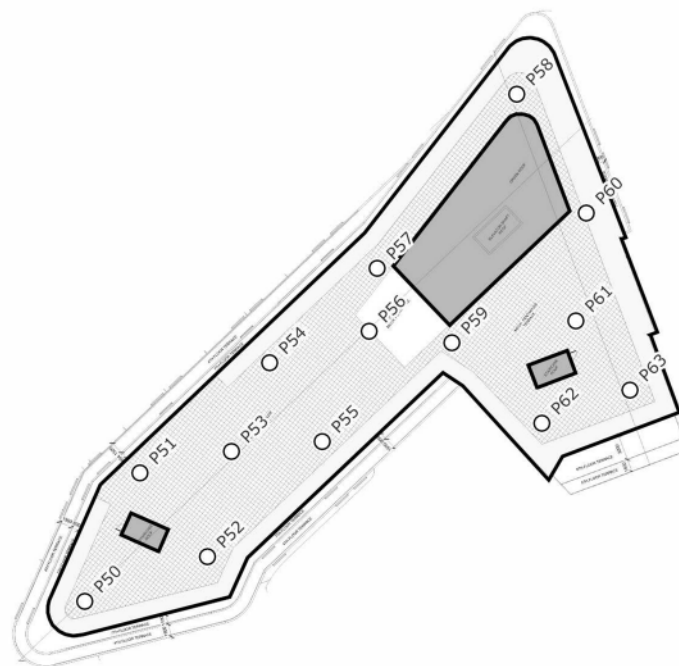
Study Point Locations and Target Wind Speed Criteria – Roof Plan
